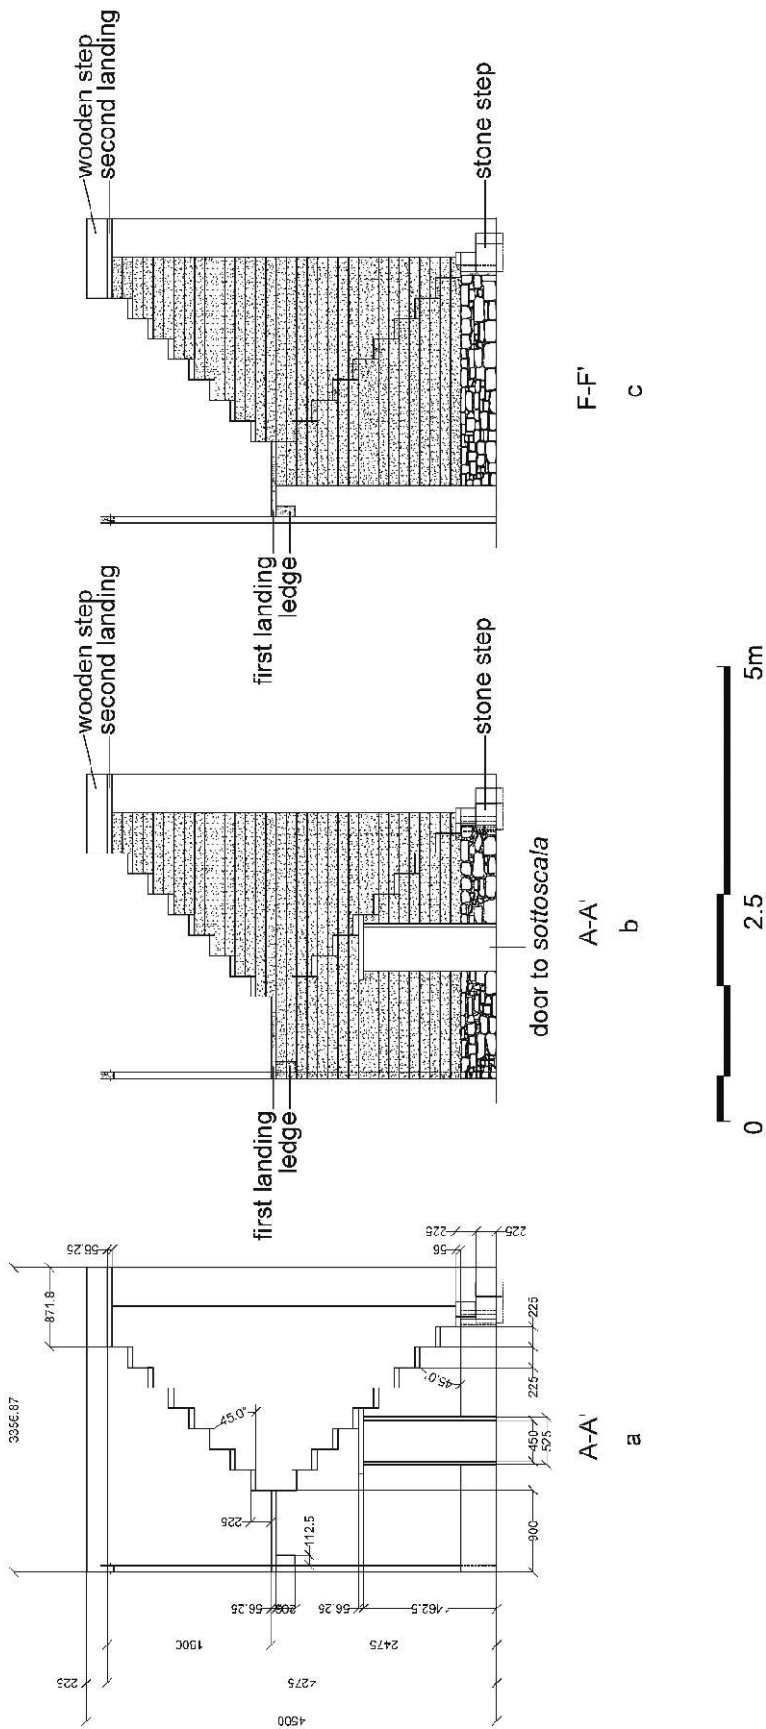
Reconstruction of the elevation and cross-section of the staircase: (a) elevation along section A-A' (see Fig. A4.1b) with dimensions; (b) elevation along section A-A' with detailing of the building materials and annotations; (c) cross-section along section F-F' (see Fig. A4.1b) with detailing of the building materials and annotations.
